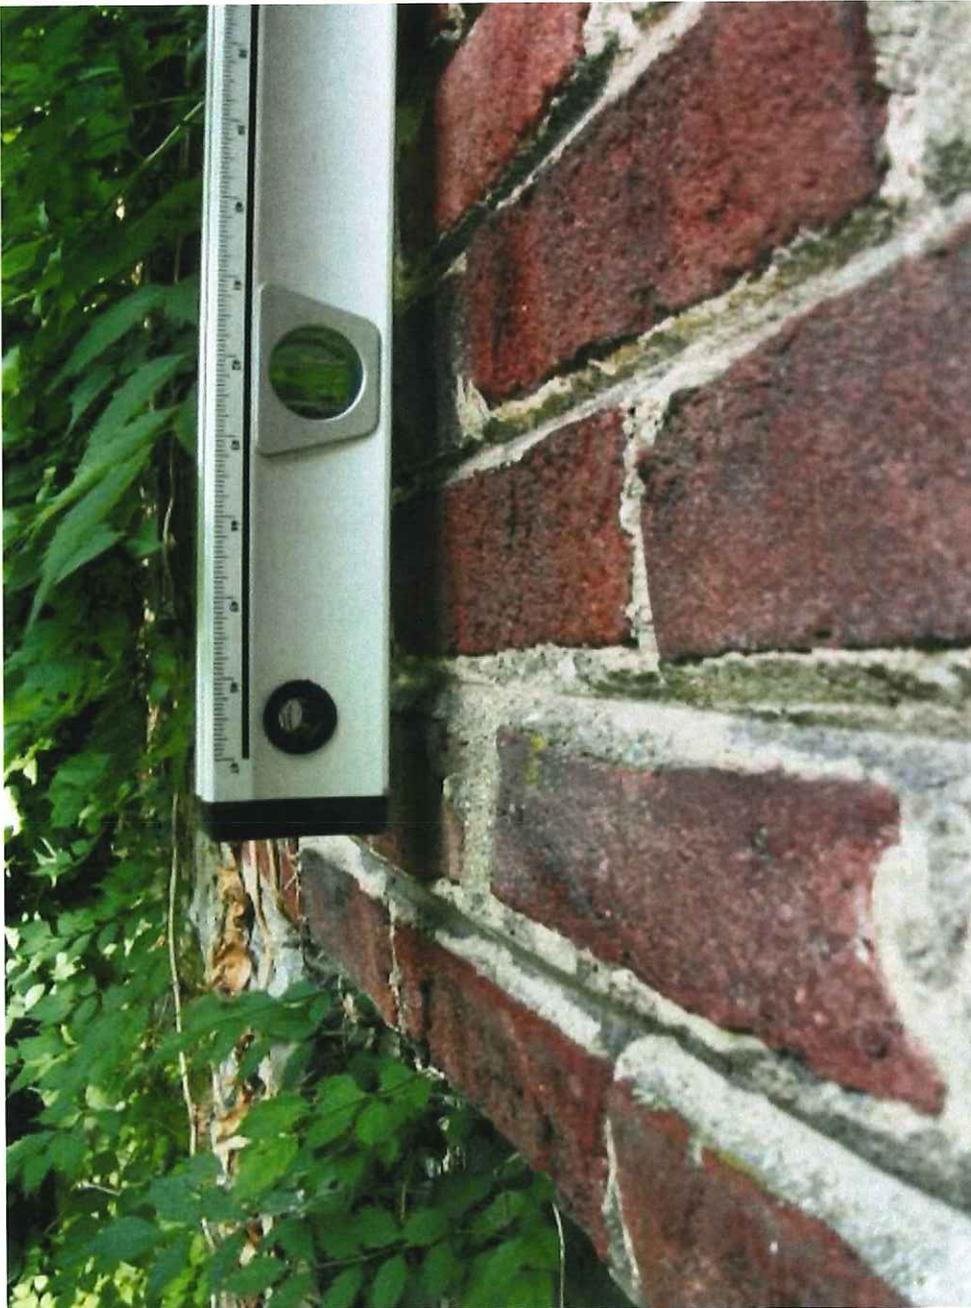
Bowing of the brick veneer on the rear wall of the residence.
